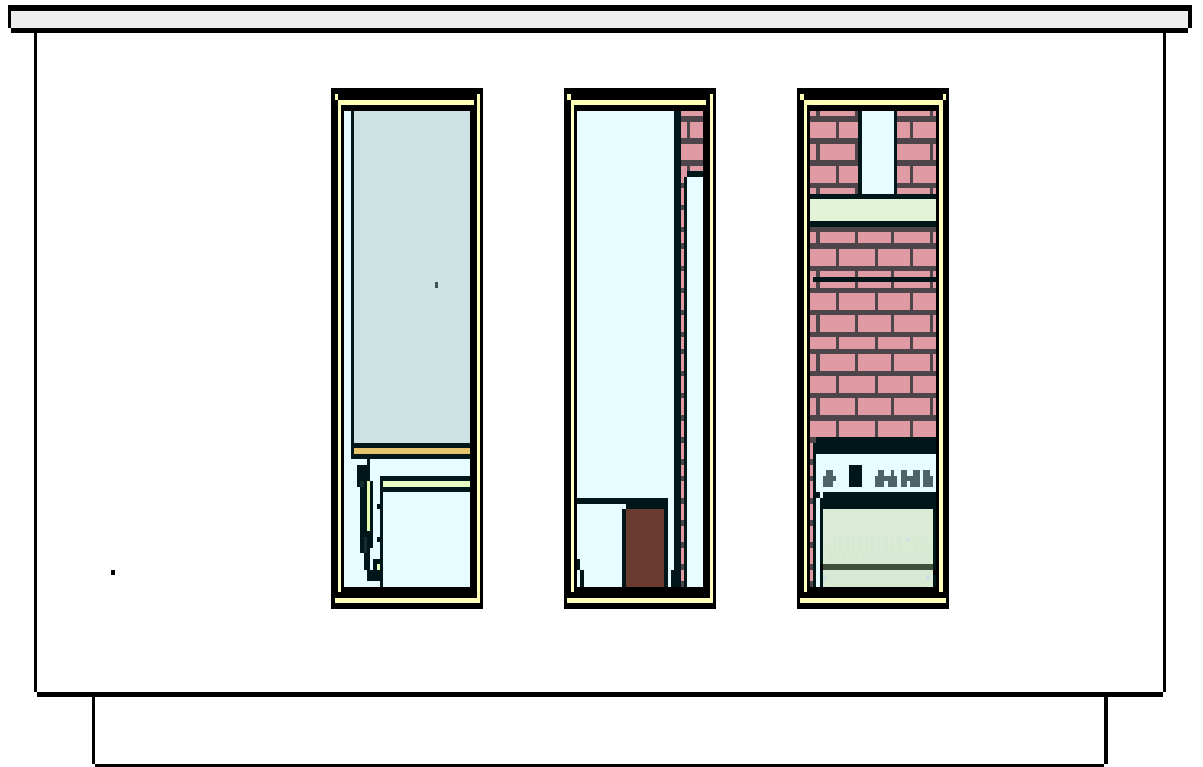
North view of 3D BIM Revit Model of flat with ceiling, floor and walls
